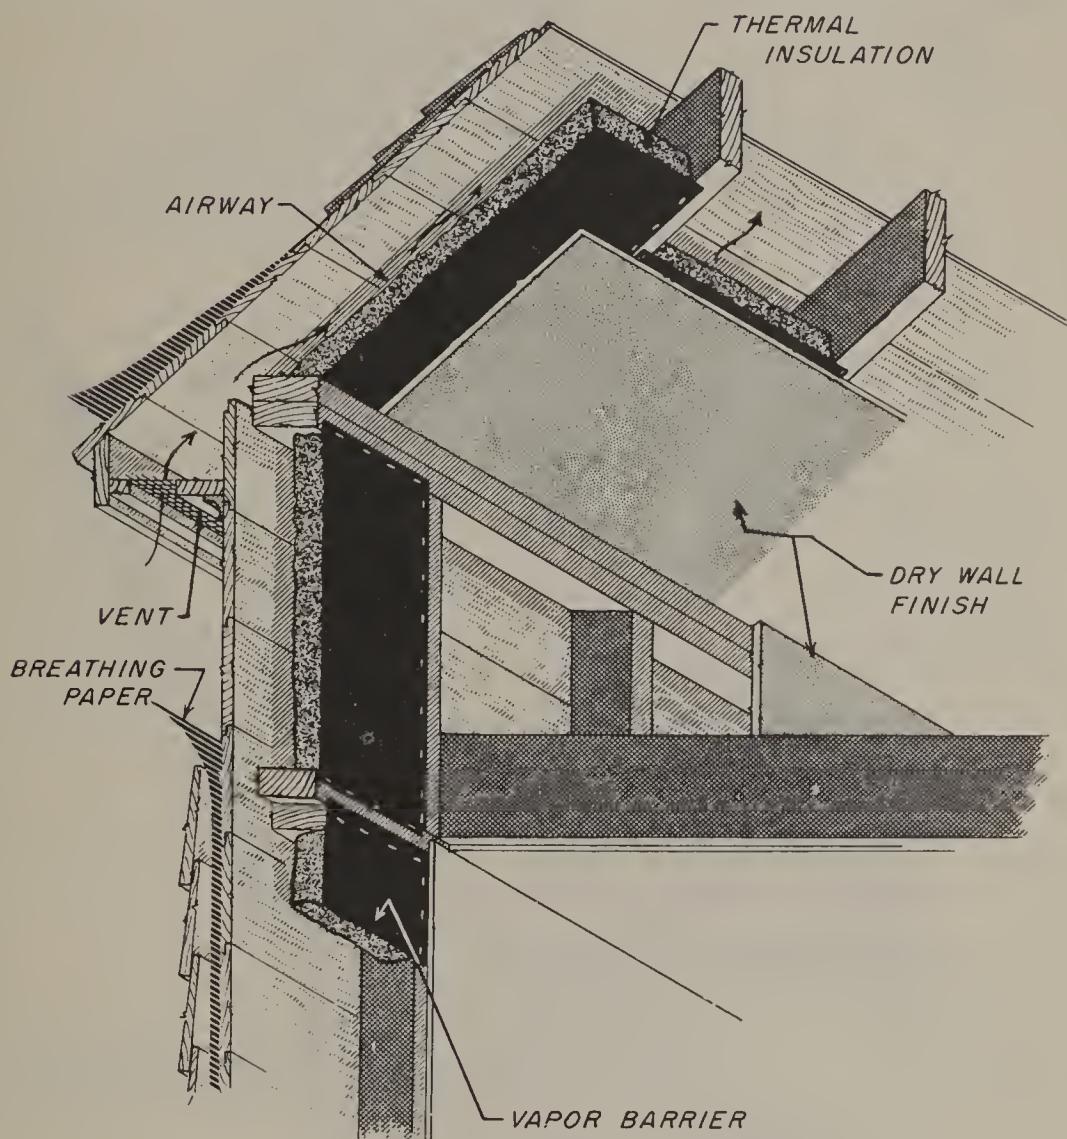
Junction of attic floor, side wall, and roof.* Blanket-type insulation is shown both in the side wall and between the rafters of the attic roof and should be equipped with a good vapor barrier for condensation control. The thermal insulation applied to the roof is of such a thickness that an airway is provided above the insulation. A ventilator is shown below the eaves to provide for air flow over the insulation and out at roof ventilators overhead. Some form of dry wall finish is suggested along walls and the lower part of the roof to prevent damage to the vapor barrier. See "Good practice recommendations" for sizes of ventilators.
